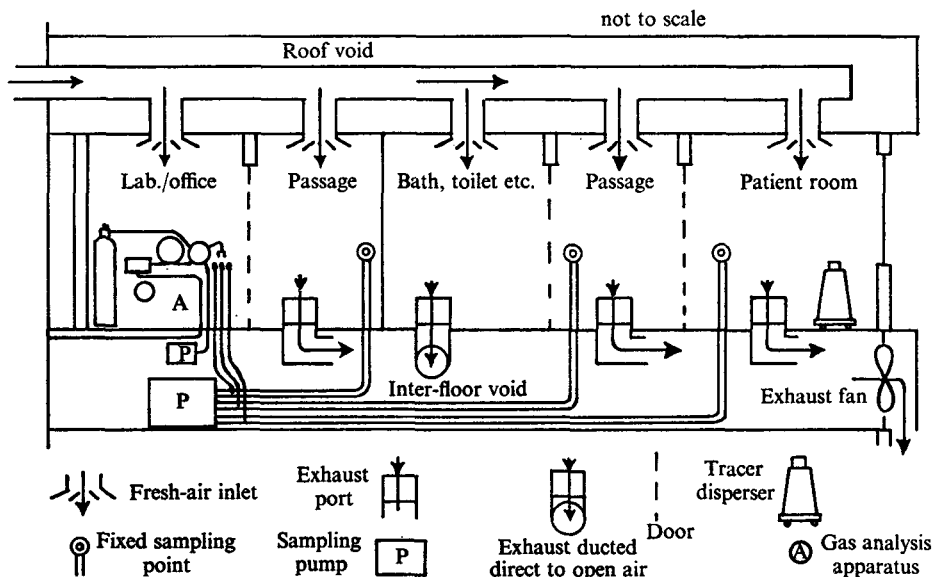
Section of the medical ward floor showing the ventilation system and the fixed sampling connexions.
